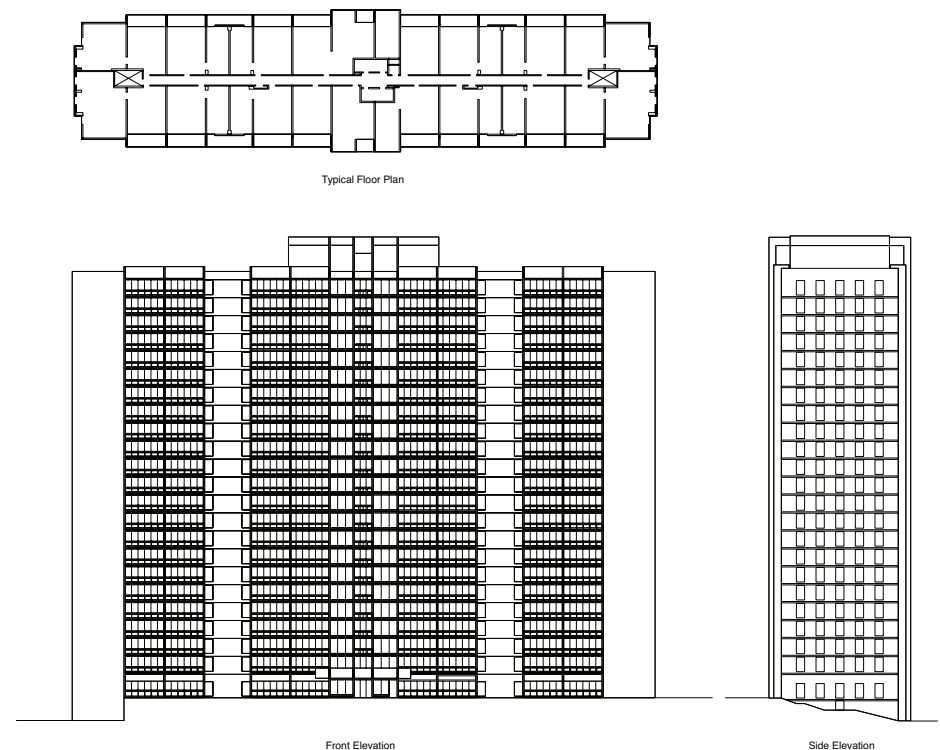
A typical tower apartment buildings of the 1960s and 70s era. Symmetrical and repetitive, the bar building form featured double loaded corridors and a relatively shallow building plate. Elevators were centrally located with internalized fire stairs at the ends of the hallway. Service shafts and chases for ducts, piping and wiring were tucked into residual bathroom and closet spaces to minimize obtrusiveness. Multiple levels of underground parking (not shown) minimized the footprint of tower development.
